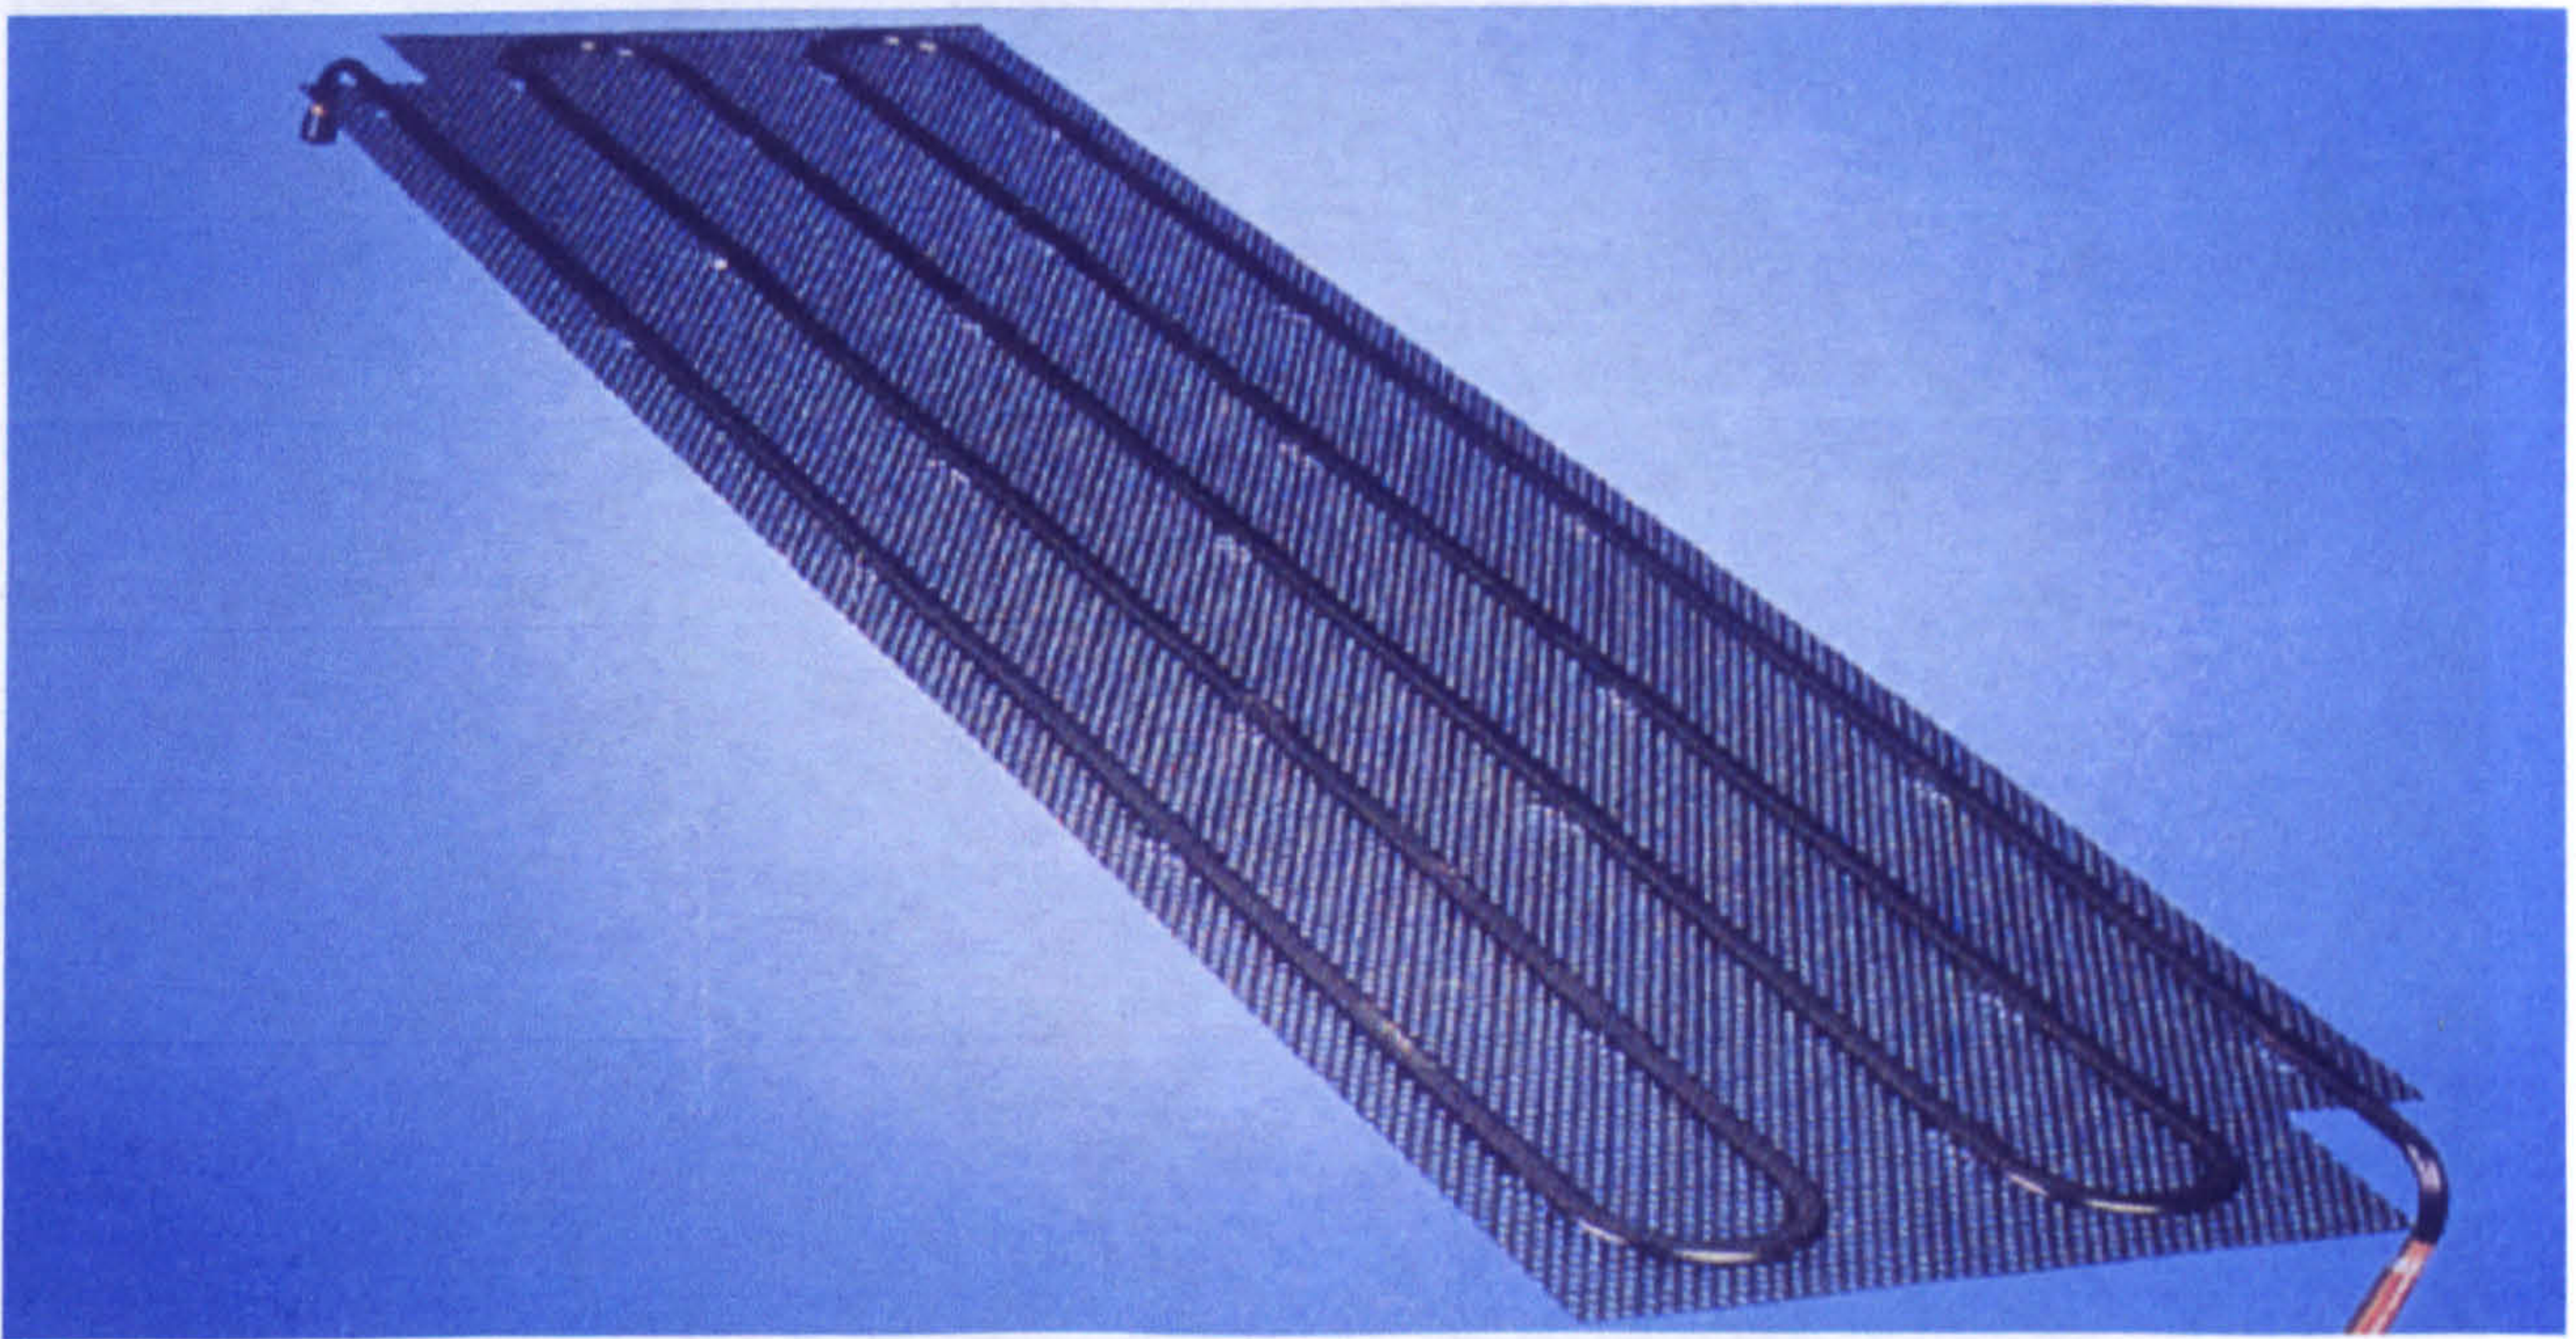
Chilled ceiling panel showing pipe work, without the external metal panel.
